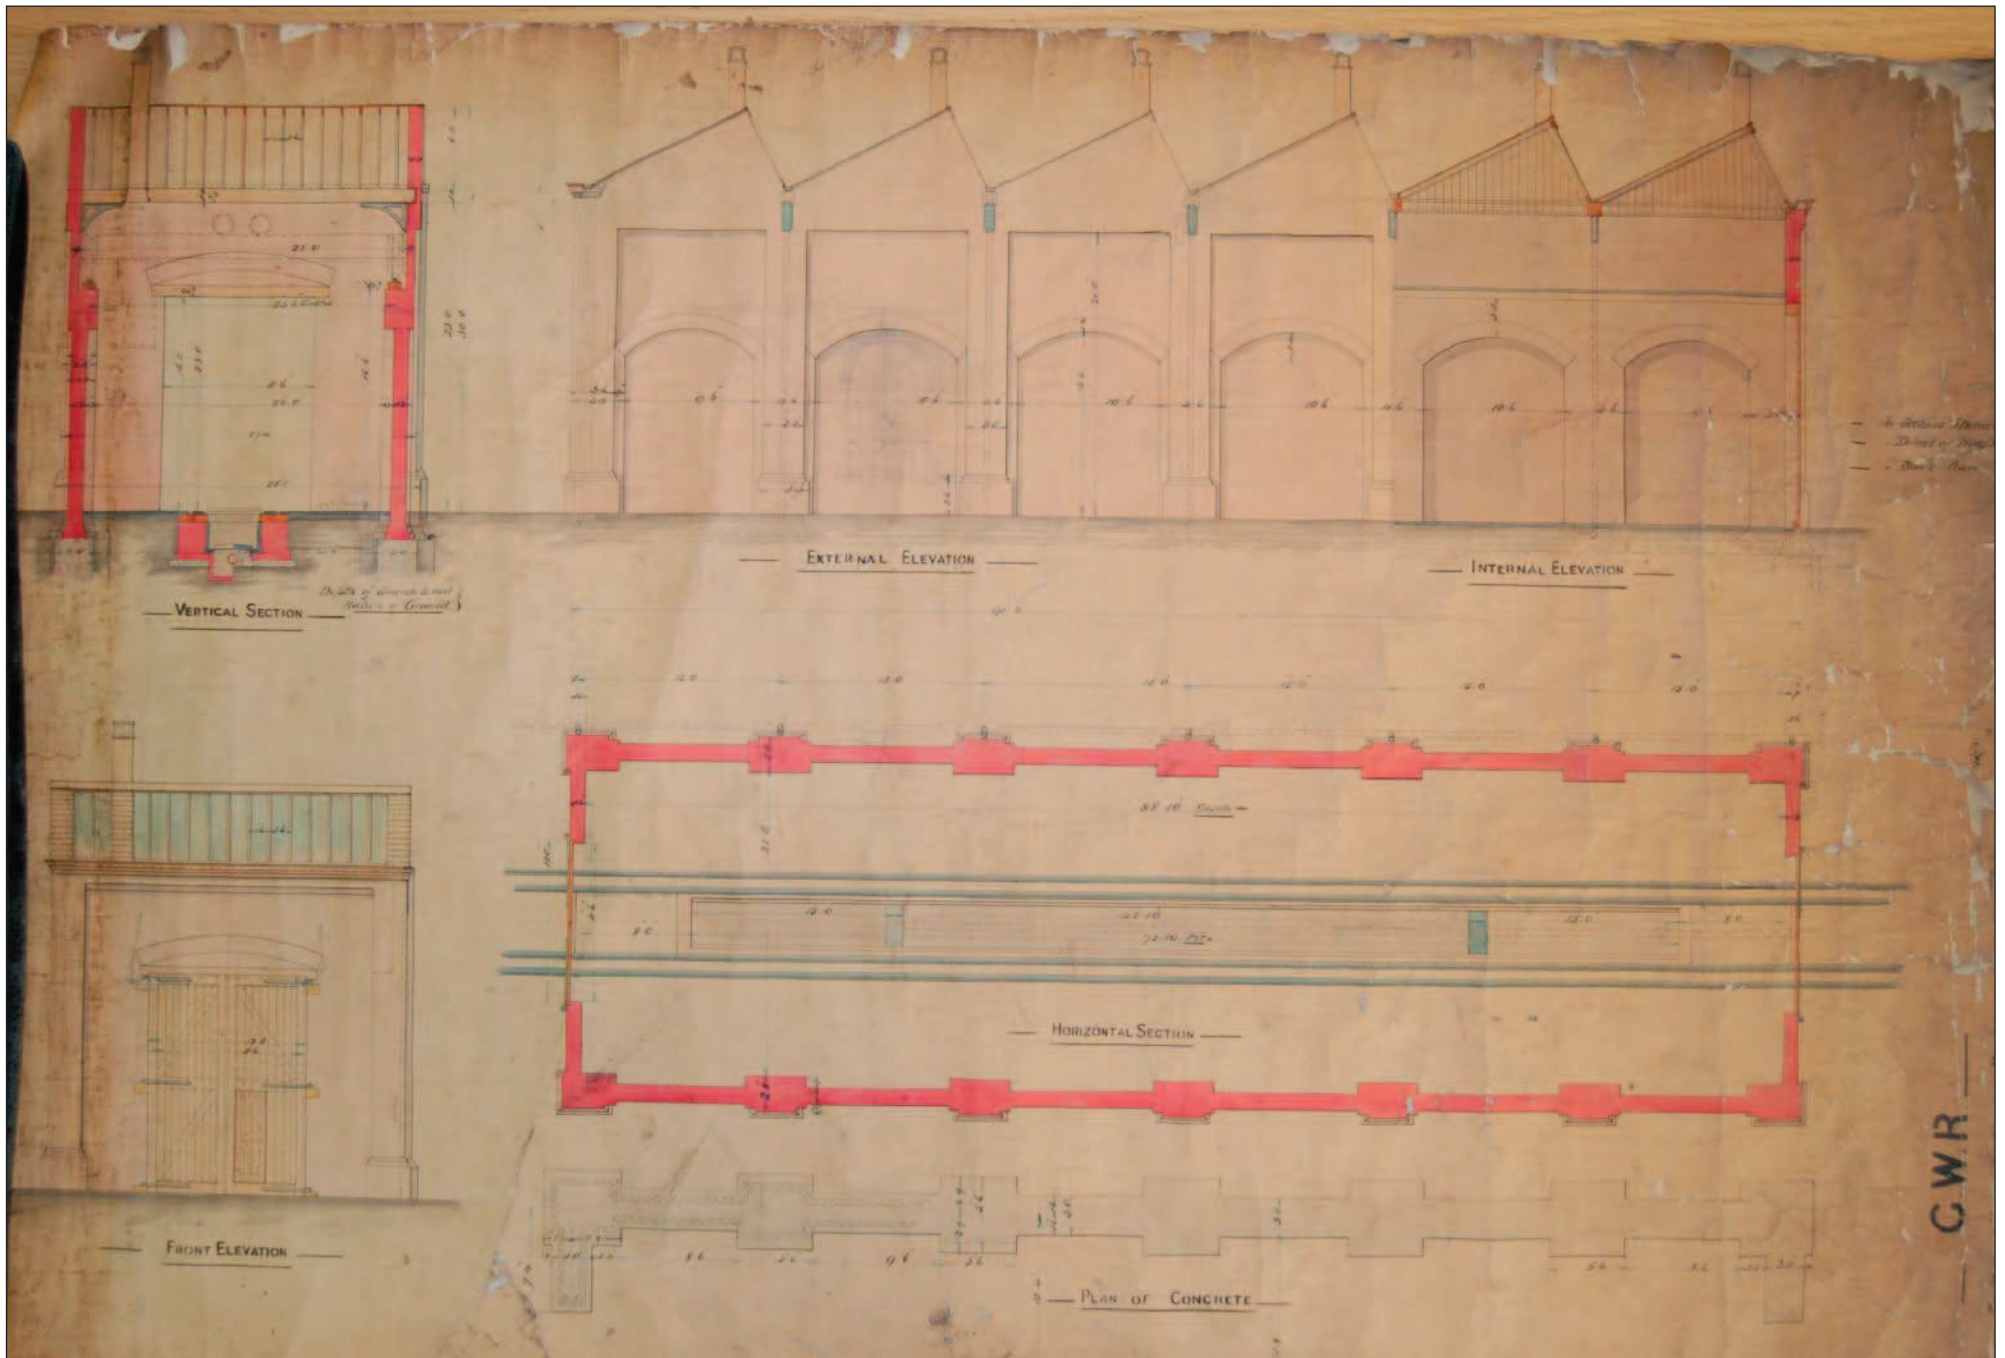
a: 1879 Proposed lifting shop; plan and elevation
